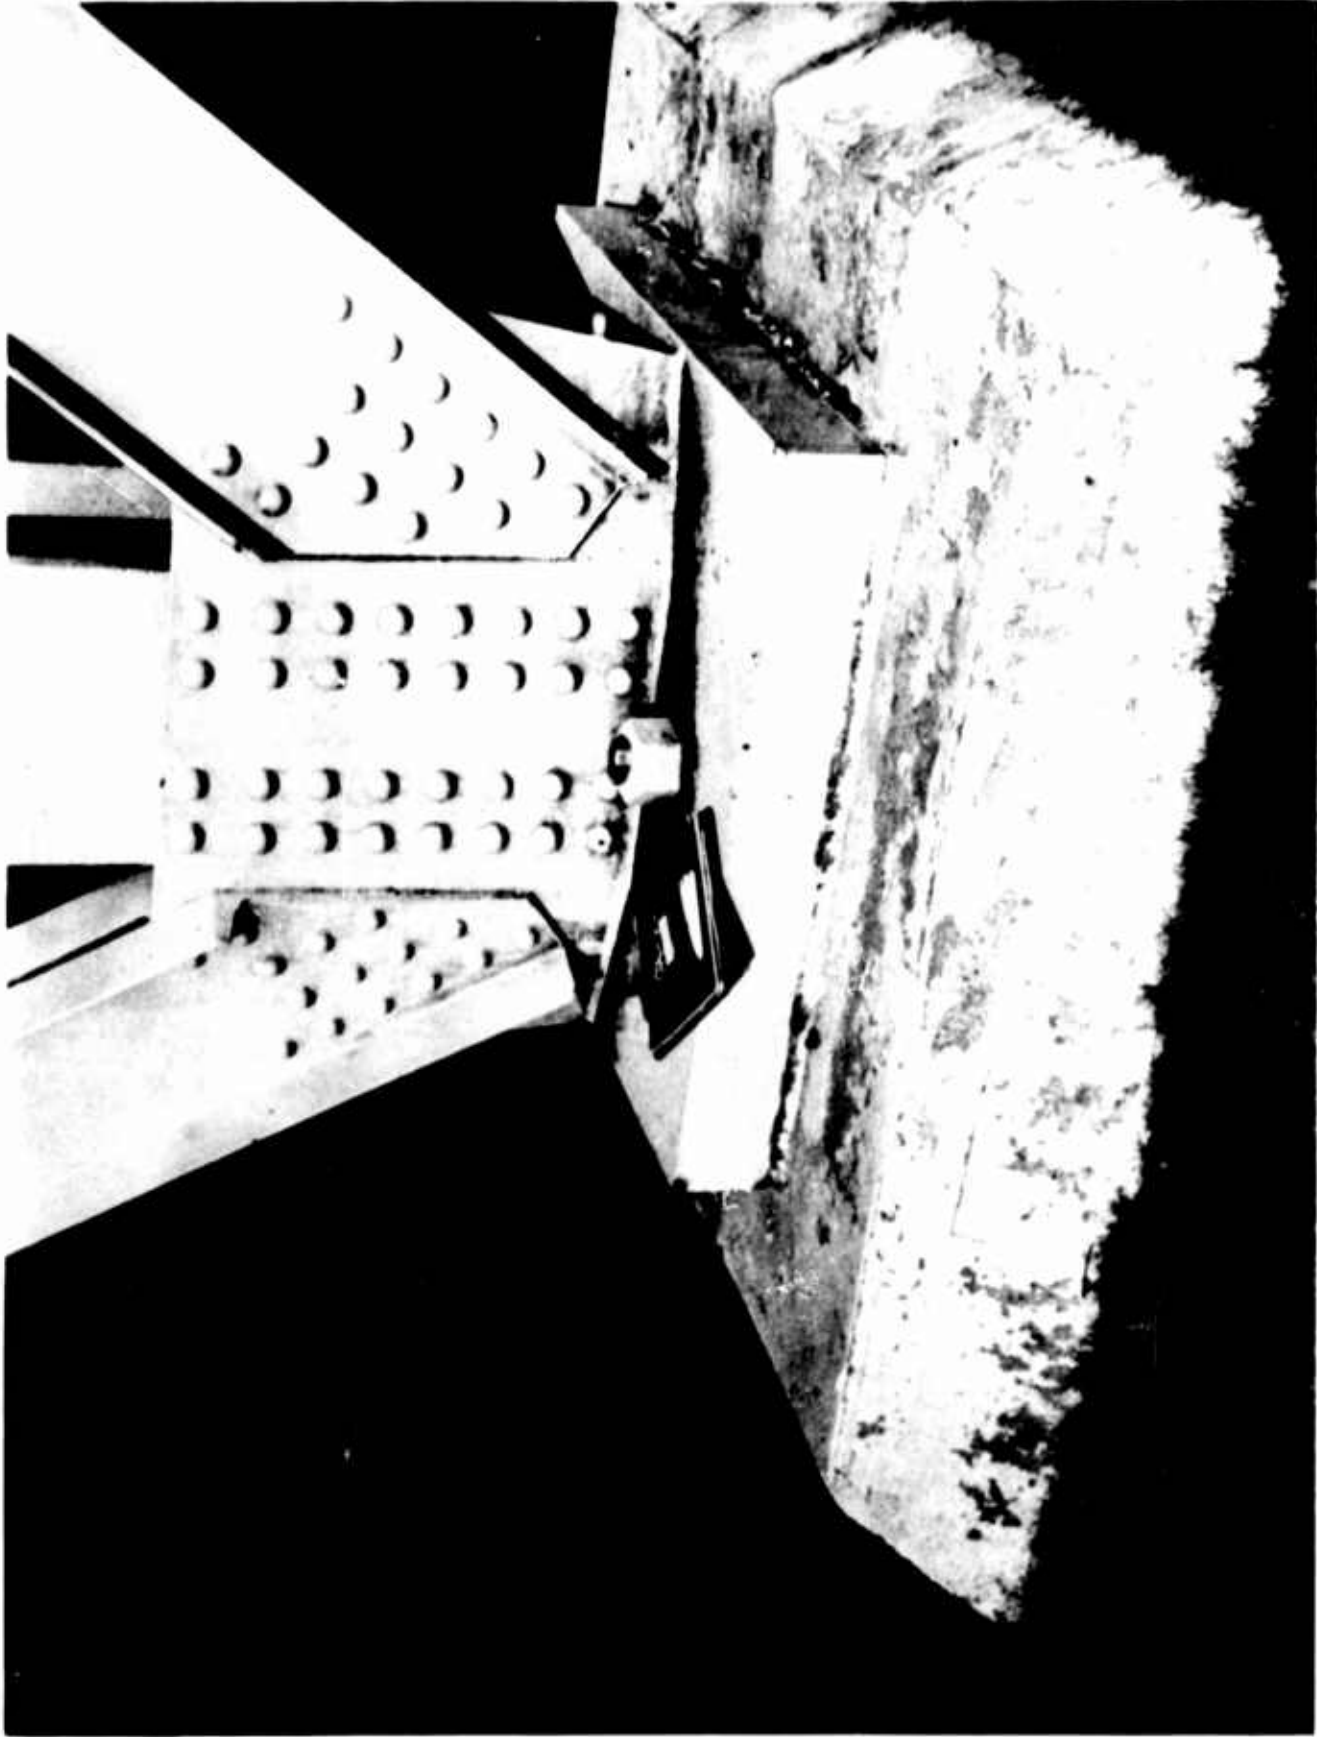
Elmendorf AFB Water Tower (Undamaged footing)
